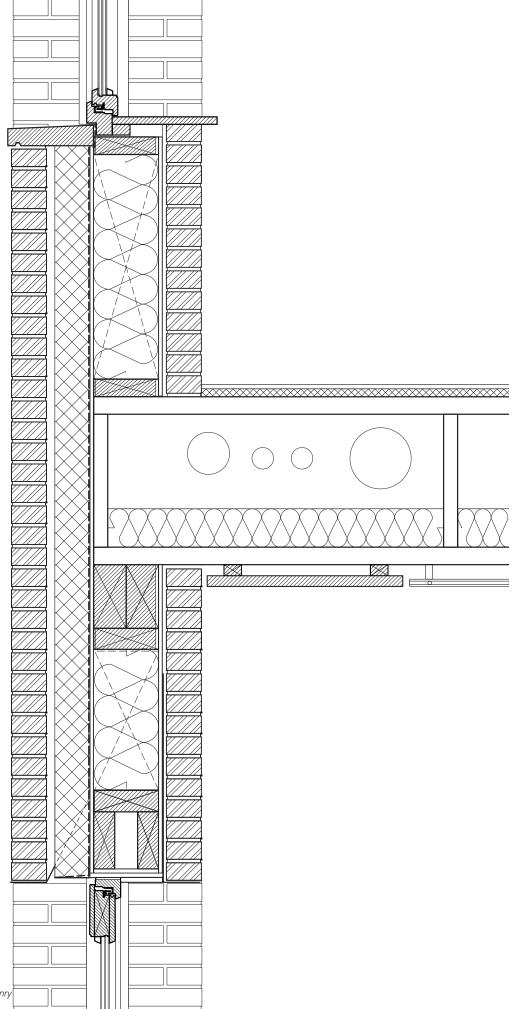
Detail joint of mezzanine floor on masonry wall in tea room and production spaces 1:10
